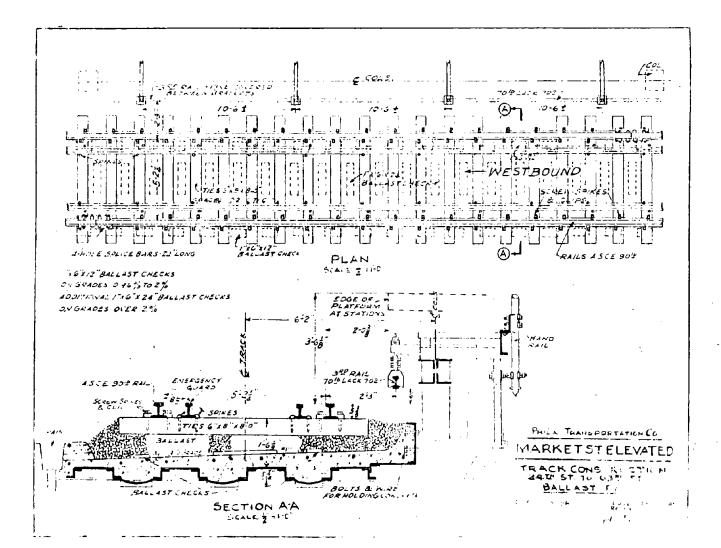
SEPTA MARKET ST. LINE ELEVATED STEEL STRUCTURE
